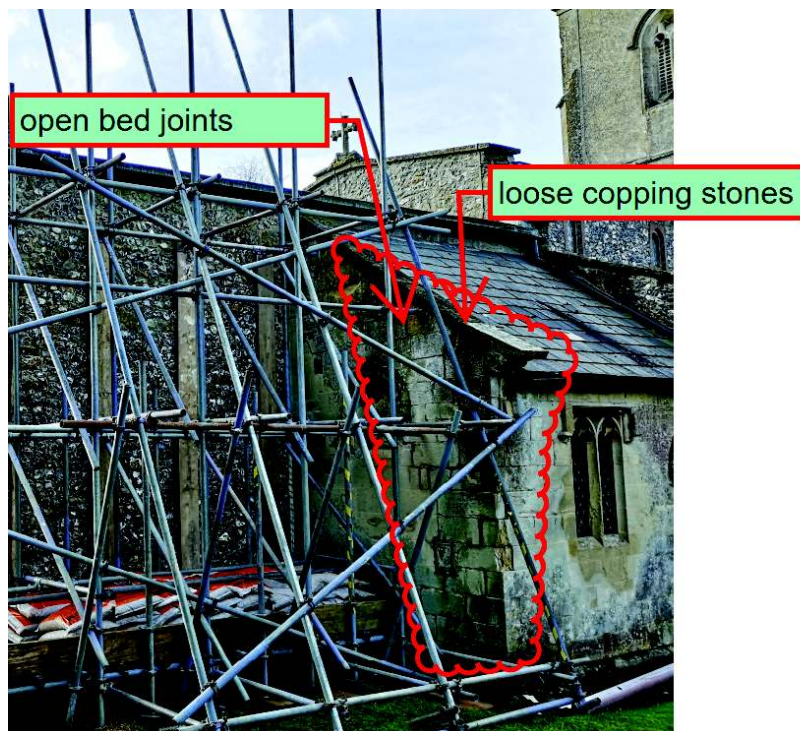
East gable cracks highlighted - crack widths vary from 2 to 10 mm. Loose failed mortar opened up cracks to suggest larger crack widths.
